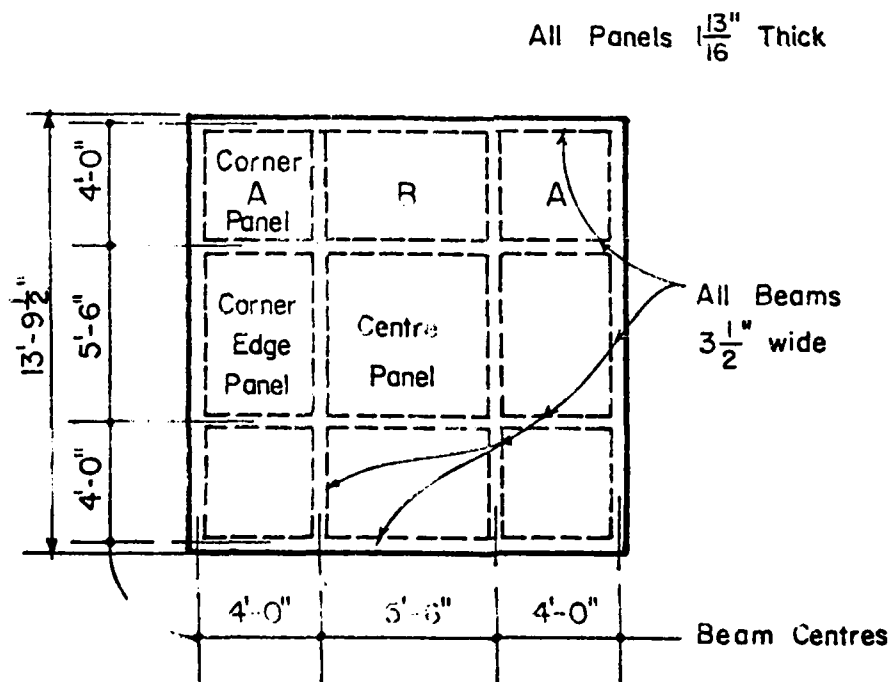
A 1/4-Scale Beam-Slab System - Hopkins and Park (from Ref. 27)
